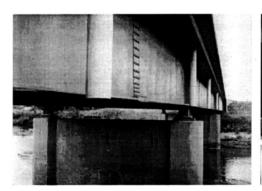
Fatigue critical bridge, I-35 (Iowa). Figure 6b. Detail of roadbed support structure.
